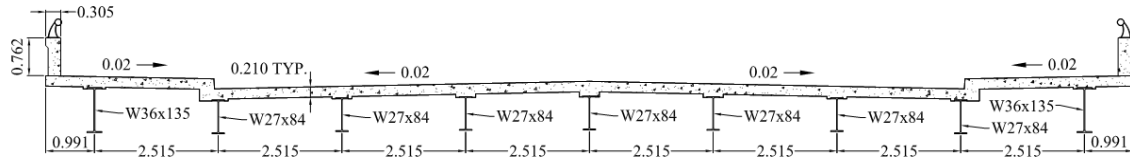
5th Avenue over James White Parkway: typical cross-section (m)
